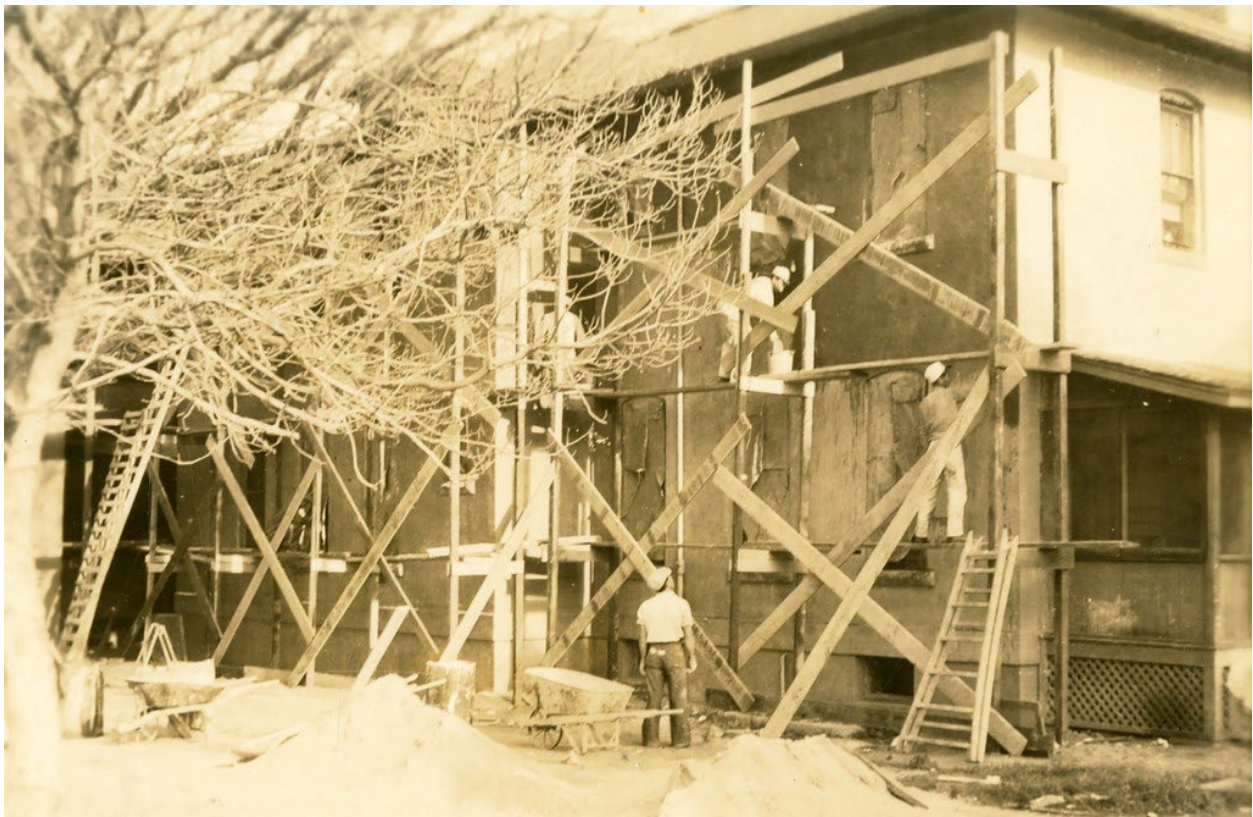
Sherman Institute students plastering the exterior of the campus hospital building, January 24, 1936, under the WPA project #1528, Box 123, Folder 2, SIM.
